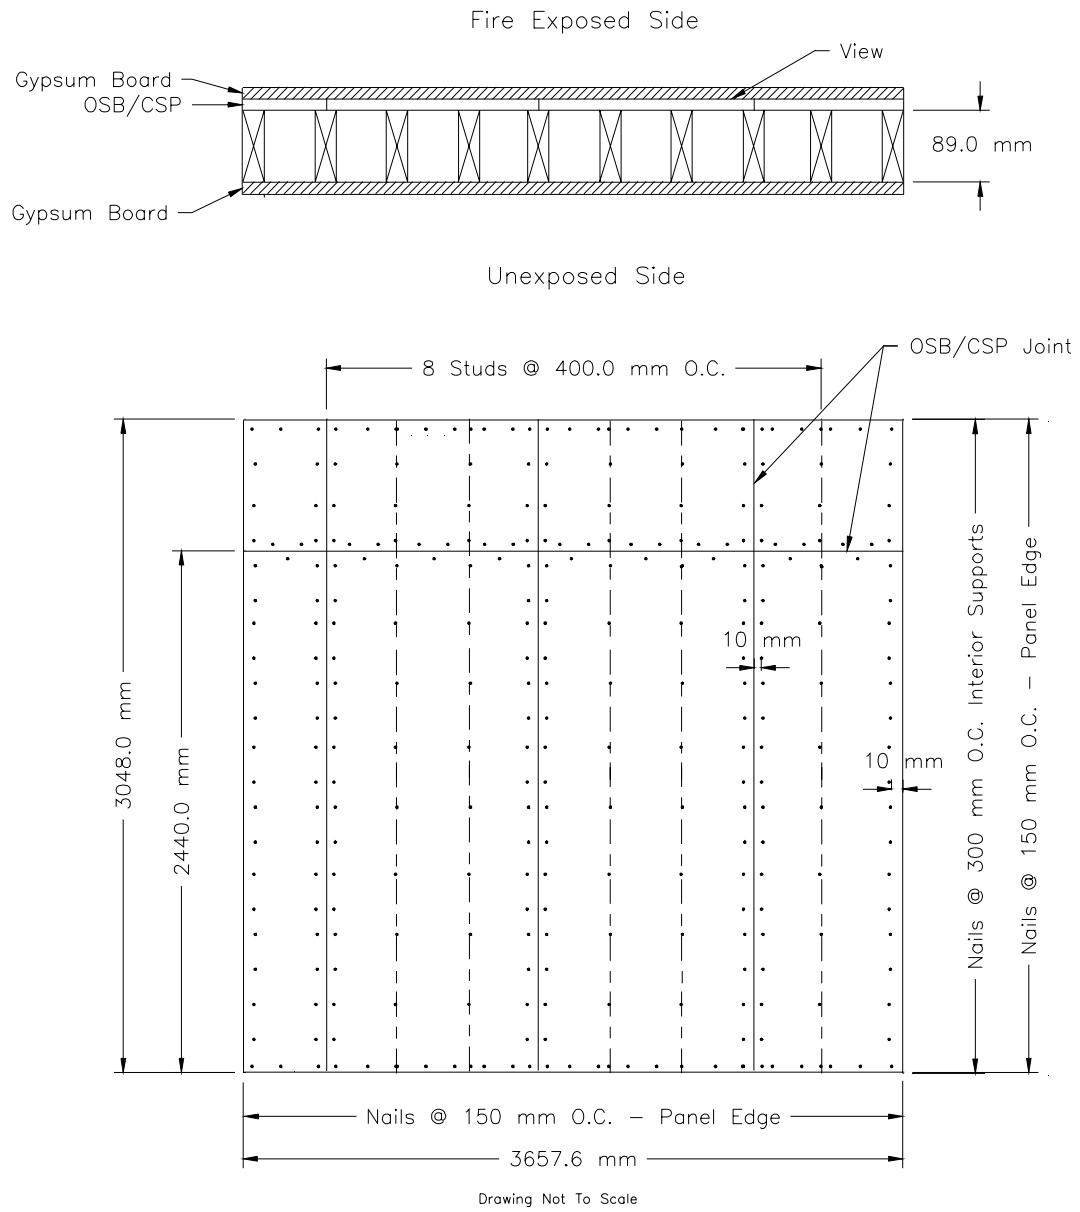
Screw Locations for Wood Stud Wall Assemblies, 2x1 Shear Membrane Layer Fire Exposed Side (F19 and F20)
